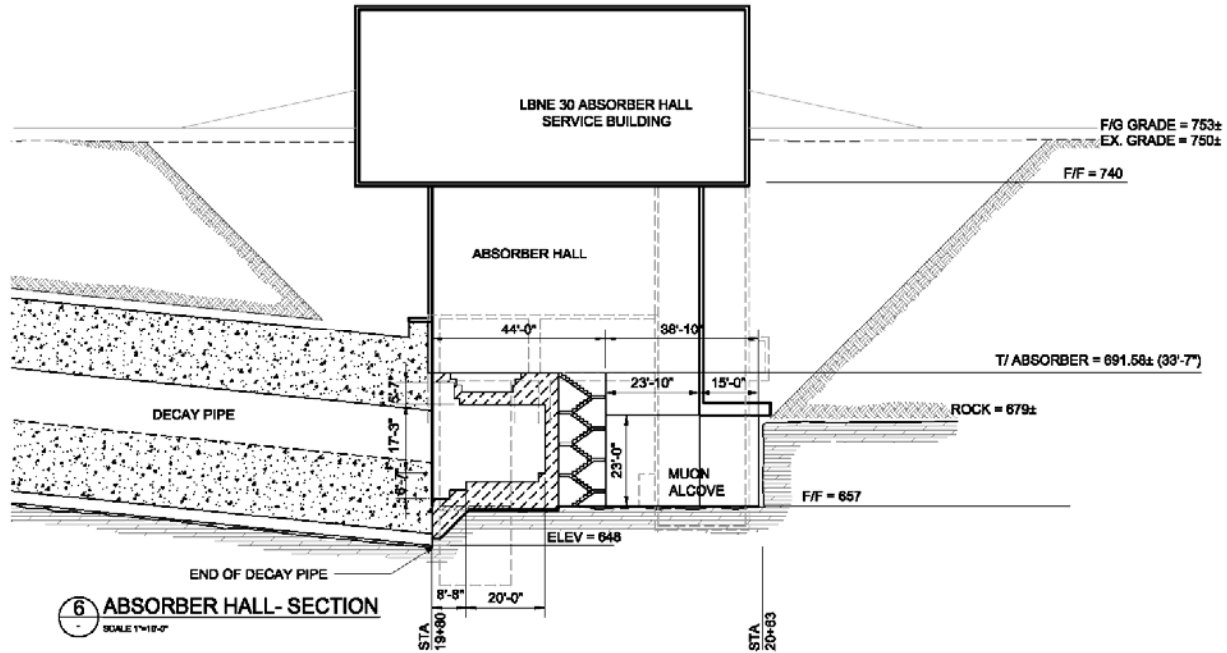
Absorber Hall longitudinal cross section cut along the decay pipe centerline.
